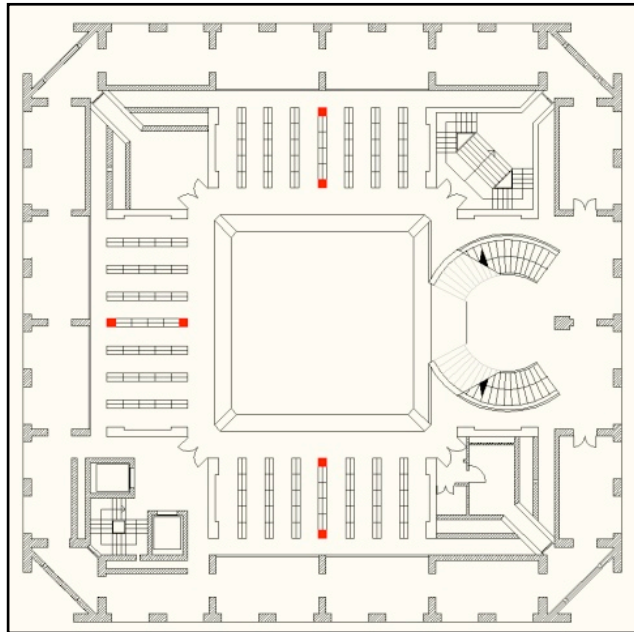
ground floor plan showing reduced columns from 12 to 6 for having more space (Re-drawn by Author)
